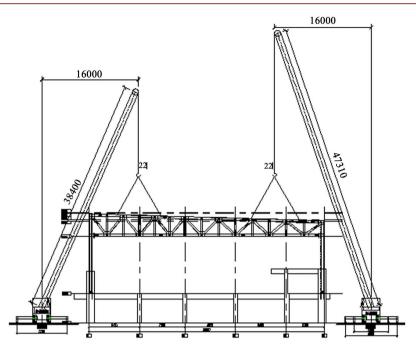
Elevation of double machine lifting 图 4. 双机抬吊立面图
